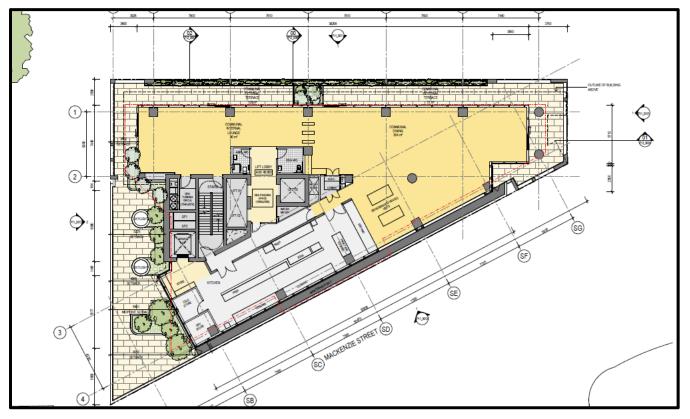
Excerpt from Level 04 Floor Plan (podium terrace level) (S.57A Amended Plans)
